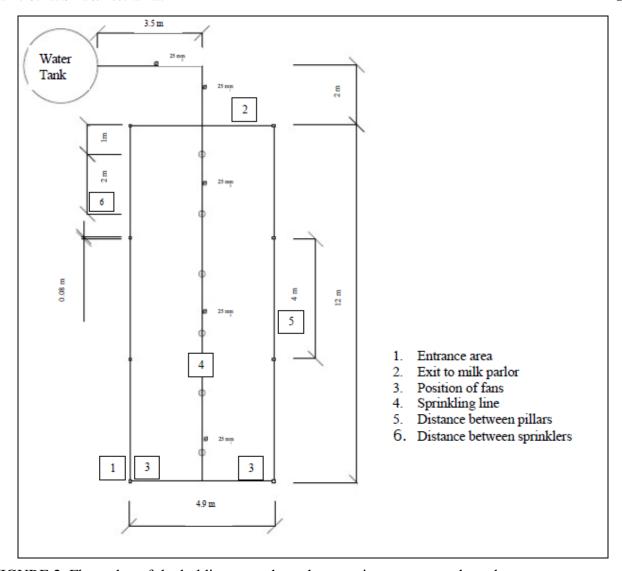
Floor plan of the holding pen where the experiment was conducted.
